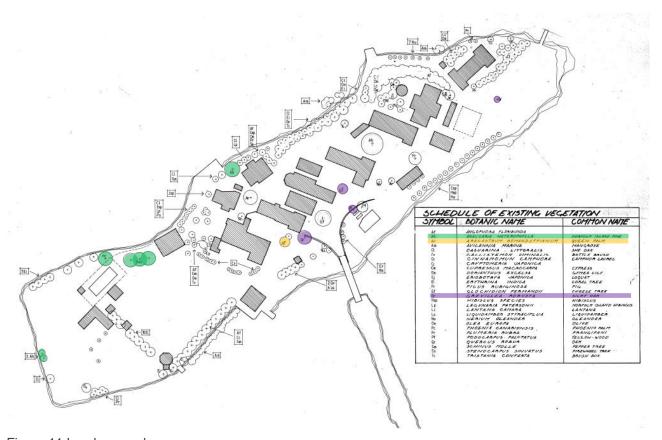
Landscape plan Source: NSW Plan Services, MH6/222
